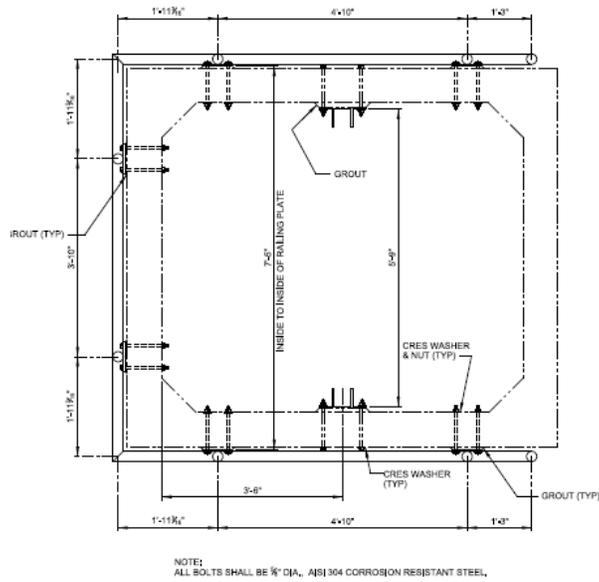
Top view drawing of stop log recesses installation on reinforced concrete box riser
